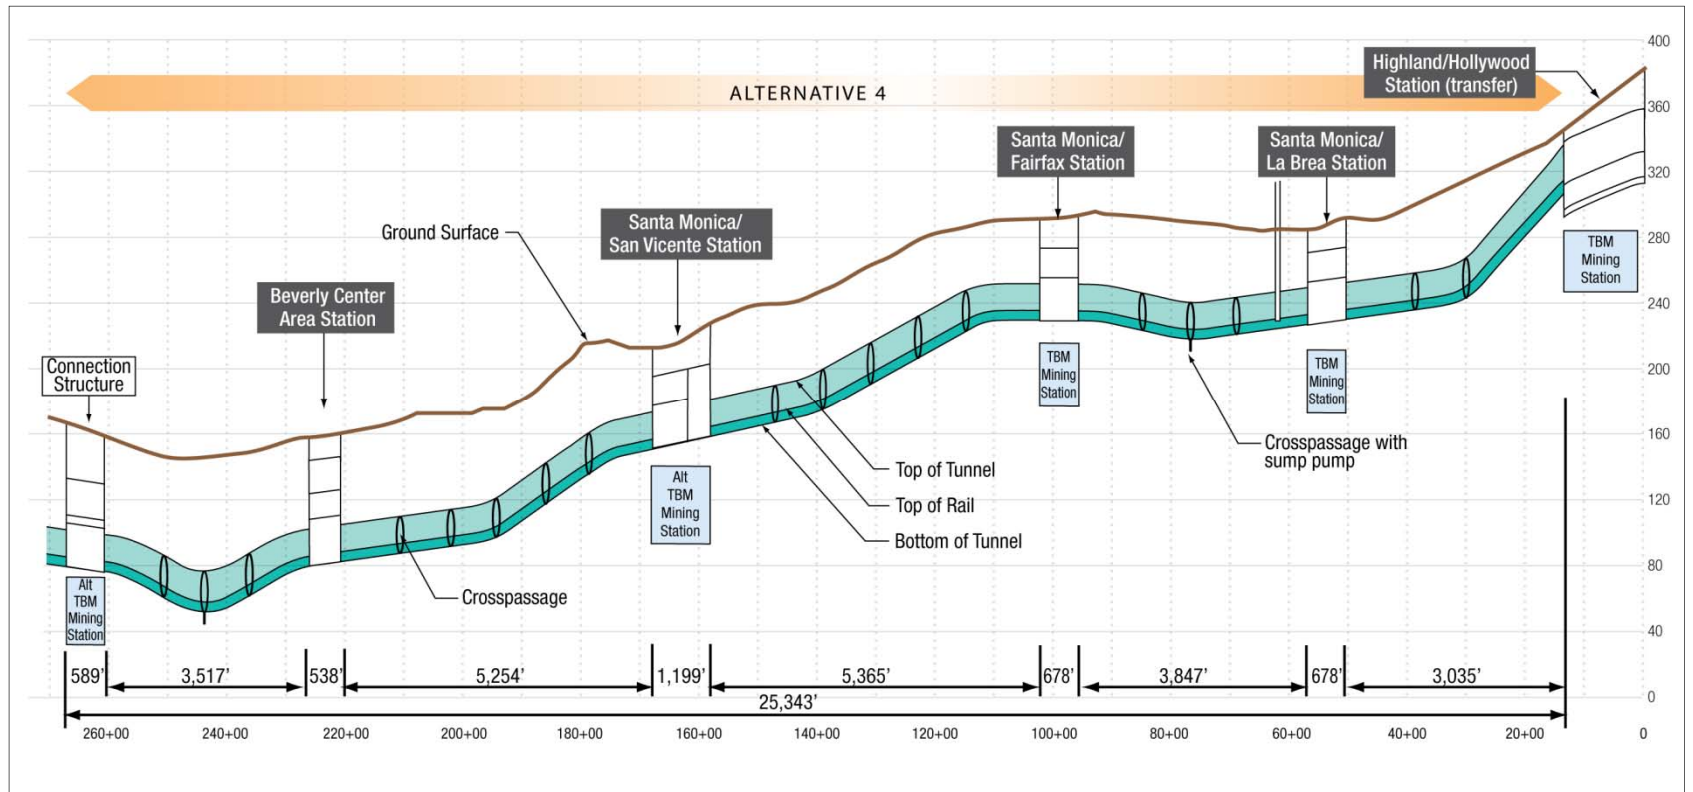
West Hollywood Extension, Hollywood/Highland to Connecting Structure
